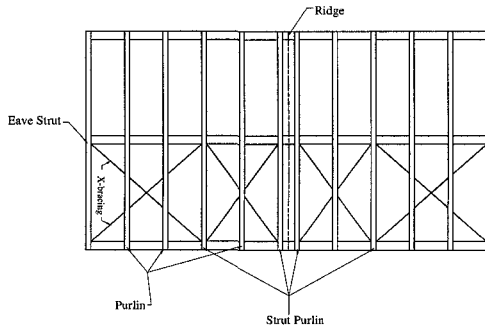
Roof Framing with Strut-Purlins Indicated
